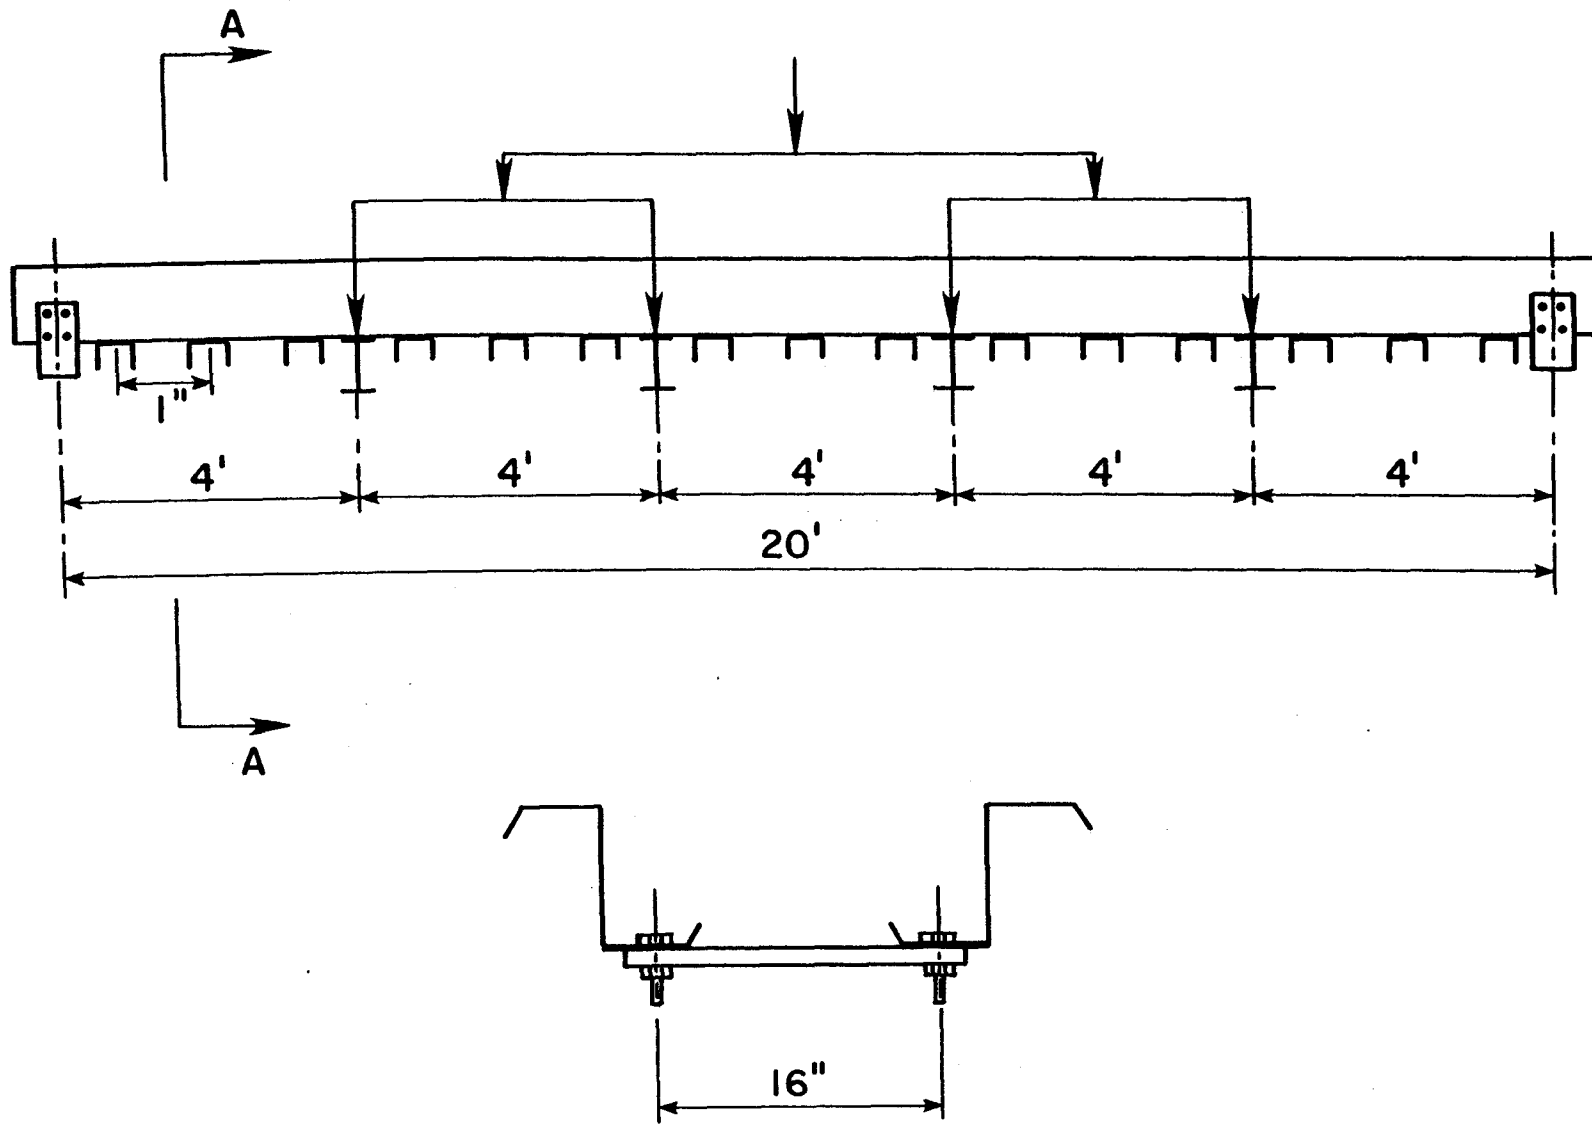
VIEWS SHOWING BEAM TEST SETUP
